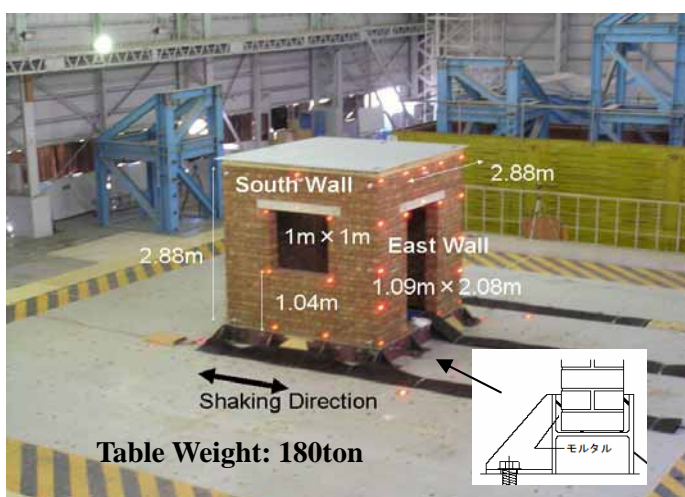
Outline of South and East Walls Base of Test House and Anchorage.
